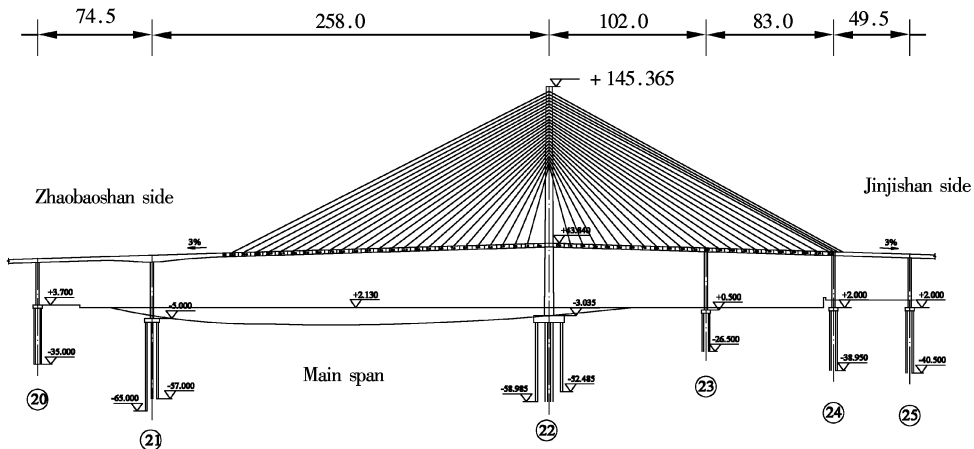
General view of Zhaobaoshan cable-stayed bridge
